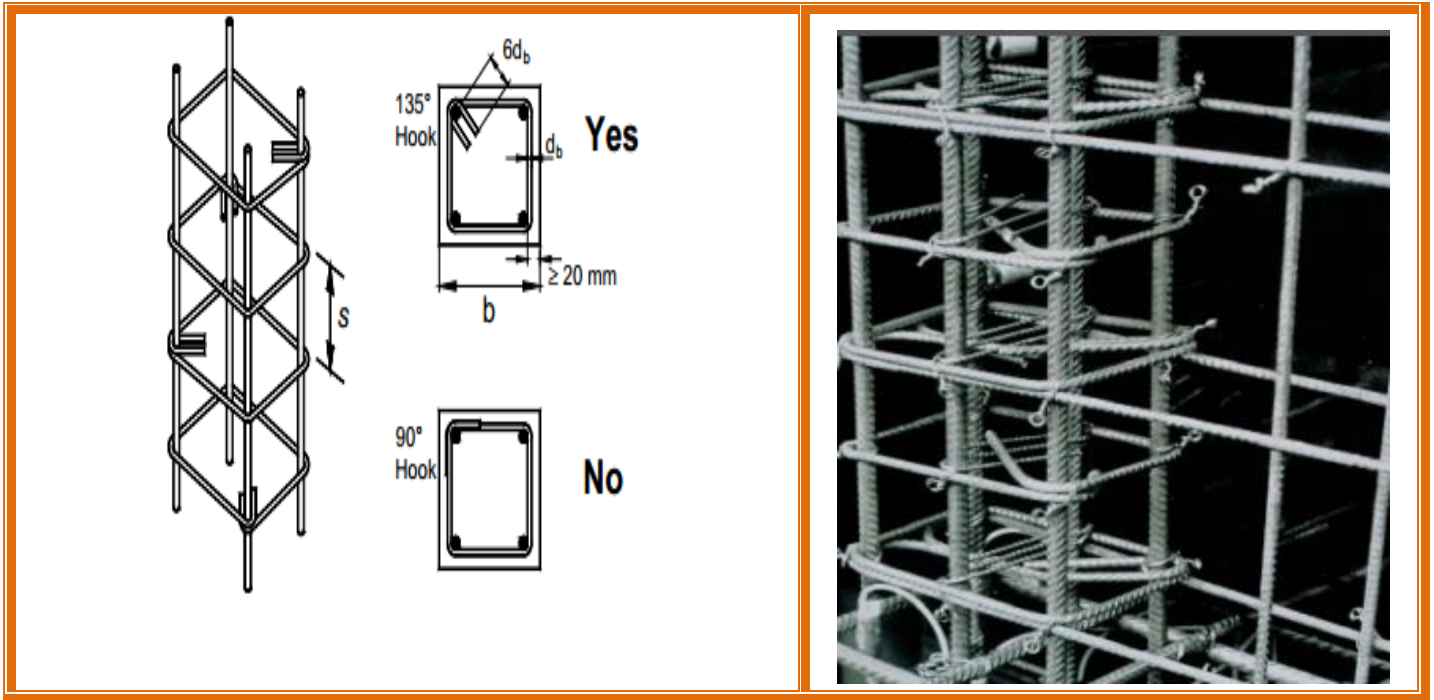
Tie layout and detailing of reinforcement in columns. ((EERI, 2011b)).
